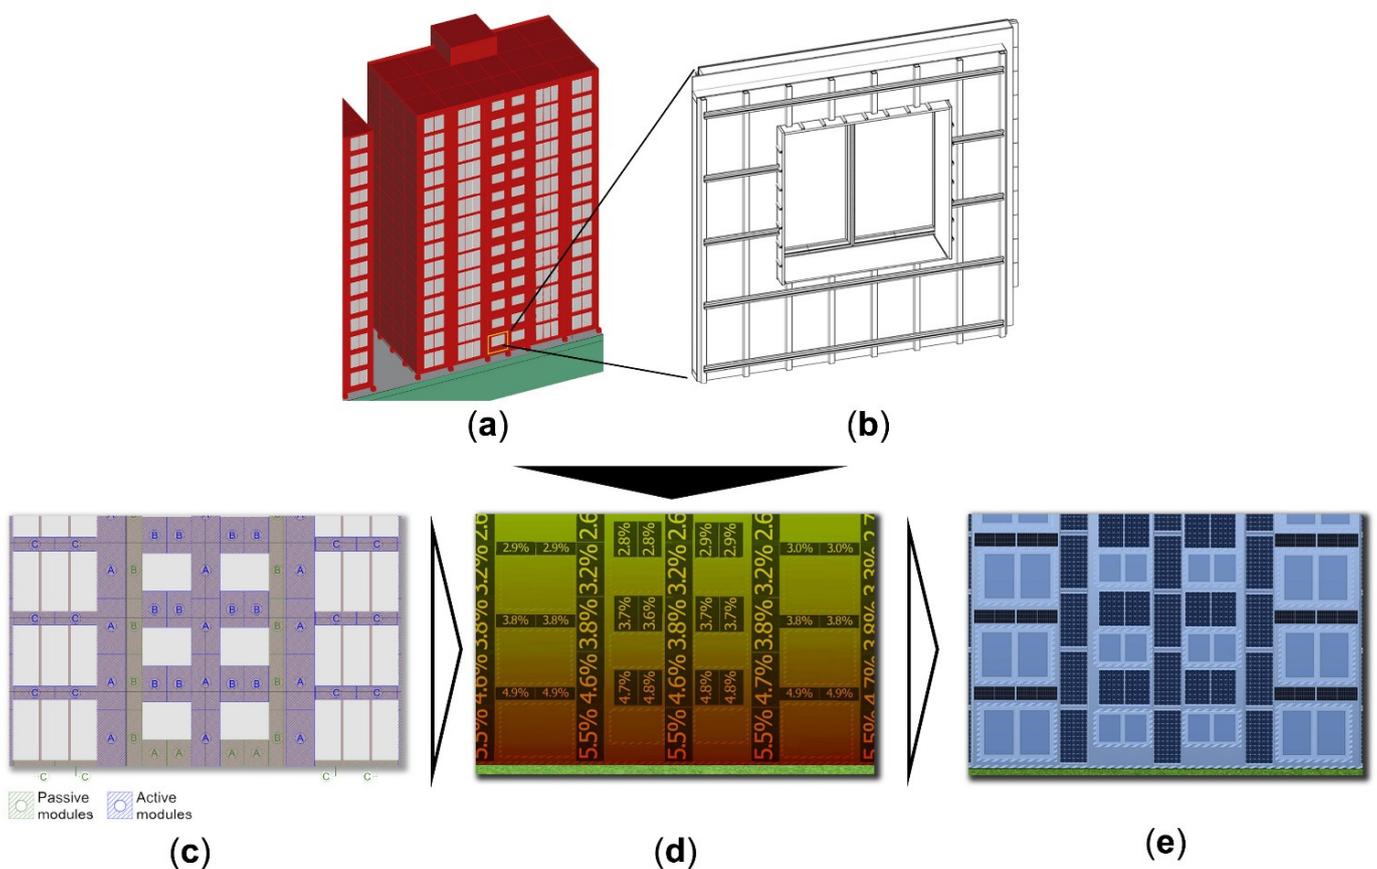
BIPV system design workflow using the example of the exemplary apartment building block A. (a) Analytical model of the building with selection of an exemplary prefabricated base surface; (b) parametrically generated building envelope renovation façade component with visible substructure for mounting façade cladding PV modules (defined in the figure with letters "A", "B" and "C" depending on module type); (c) PV module allocation according to design criteria and selected products from PV*SOL; (d) simulation of irradiation on selected PV modules; (e) final BIPV façade design in PV*SOL without passive façade cladding panels.
